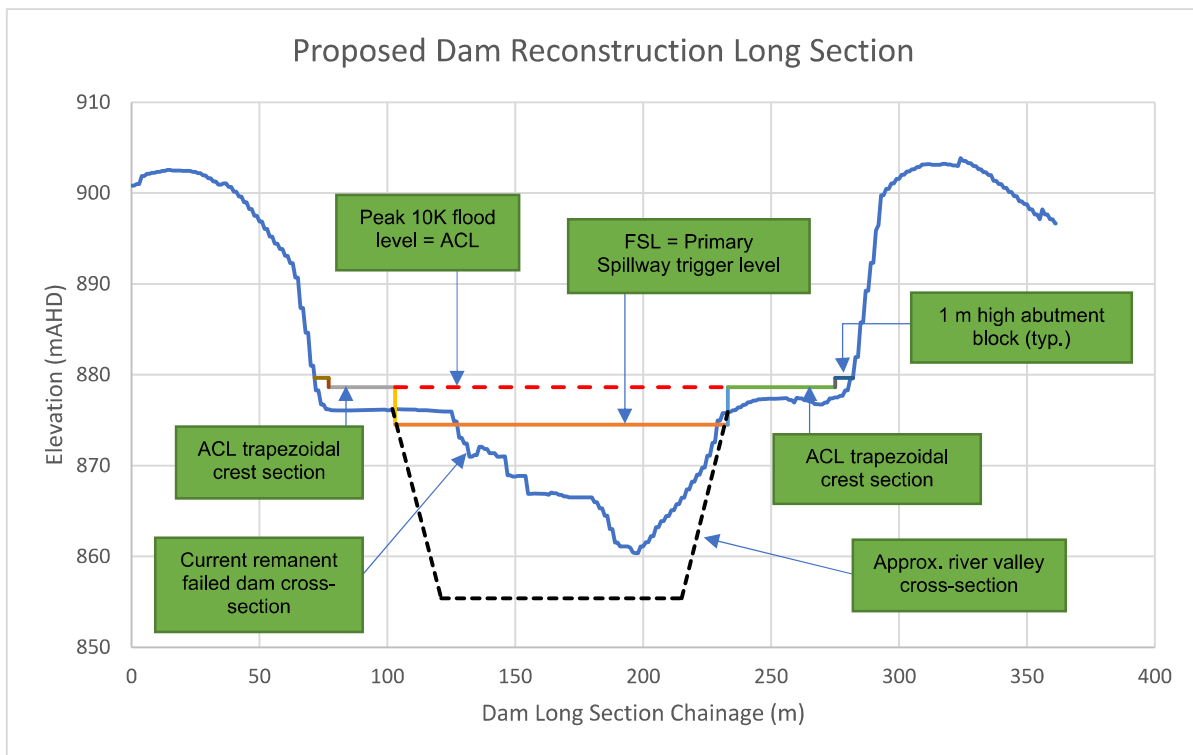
Proposed Dam Reconstruction Long-Section (facing downstream)
